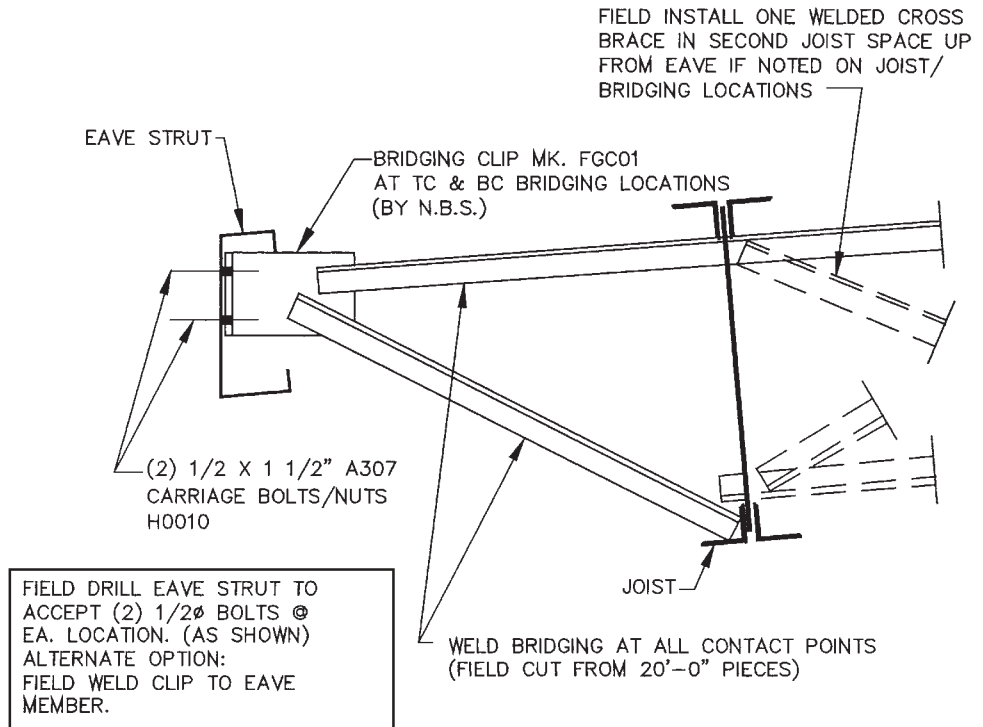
Attachment of open-web joist bridging to eave strut. (Nucor Building Systems.)
